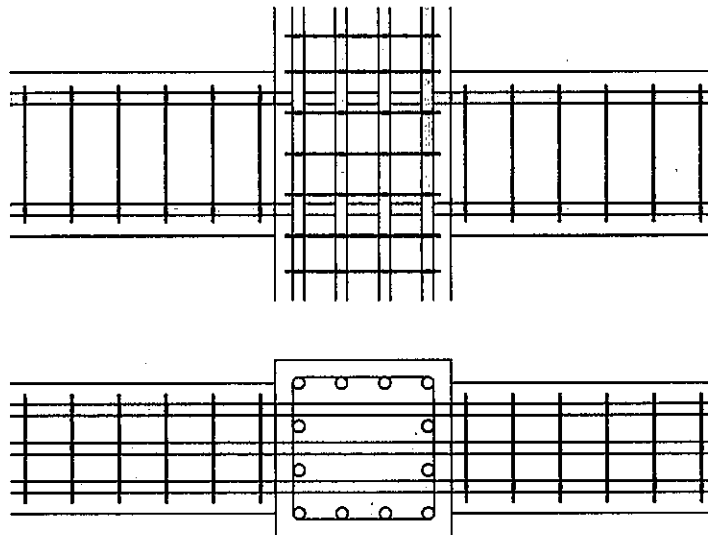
Beam-Column Joint of Reinforced Concrete Structures
